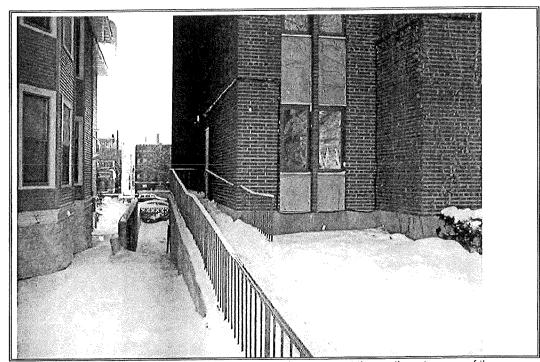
Photograph Number 17: Plumbing exposed to exterior due to damaged enclosure provisions.
